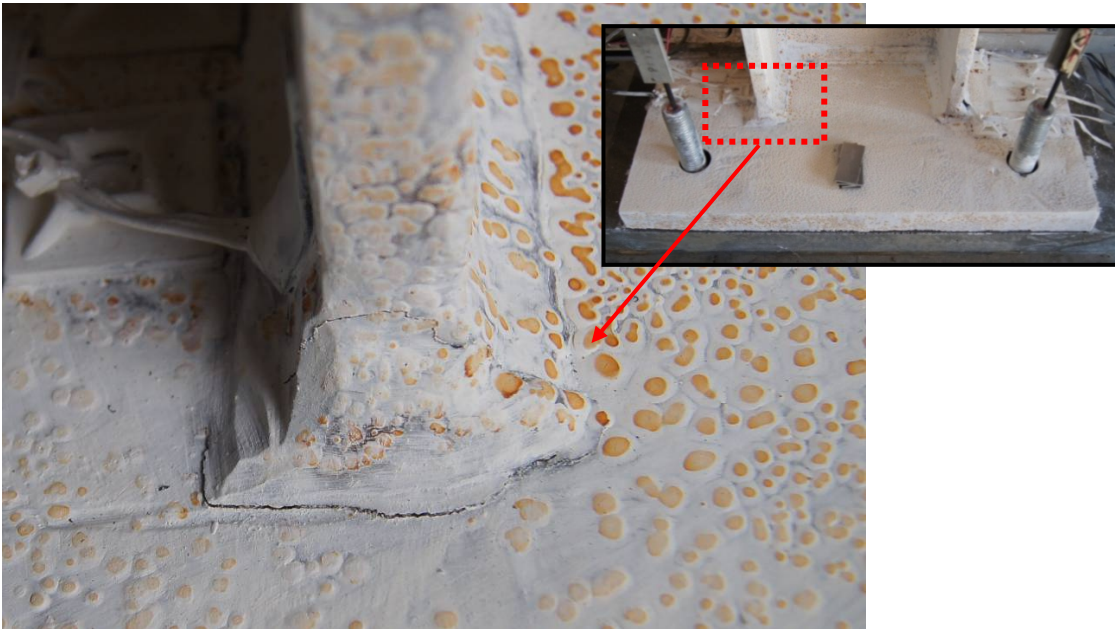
Cracking at NW flange weld, 3% imposed drift (first excursion to the south)
